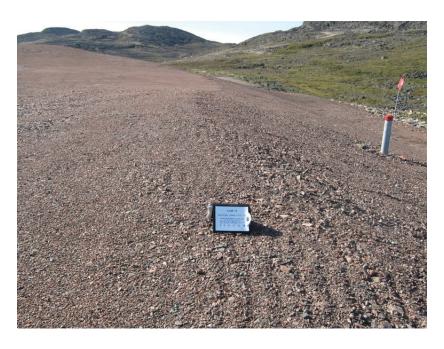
Panoramic photo facing west to the northeast corner of the landfill. ↑
